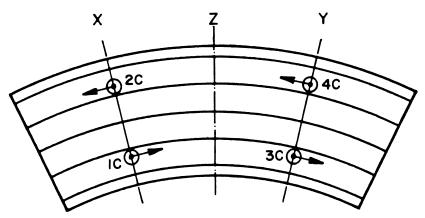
shows the positions and directions of the truck and construction vehicle loads on the bridge. As described in Vol. I, a total of 11 combinations of two lane truck loadings, 3 combinations of three lane truck loadings, and 8 combinations of construction vehicle loading were used. Because each vehicle had six wheels and the front wheels had smaller loads than the rear wheels, exact symmetry of loading about the bridge longitudinal and transverse centerlines was not maintained, Fig. 5.22.
